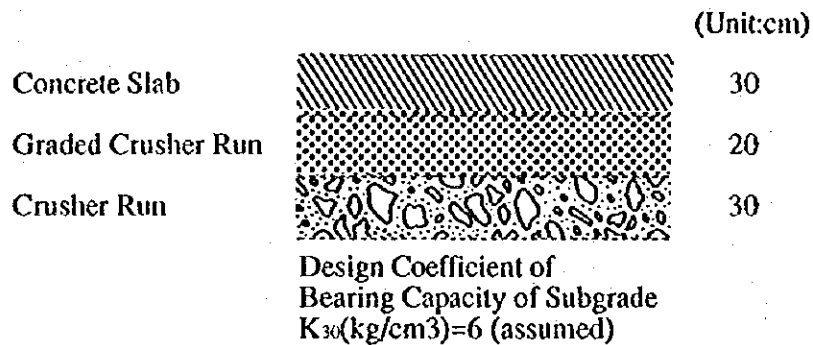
Standard Cross Section of Container Yard
